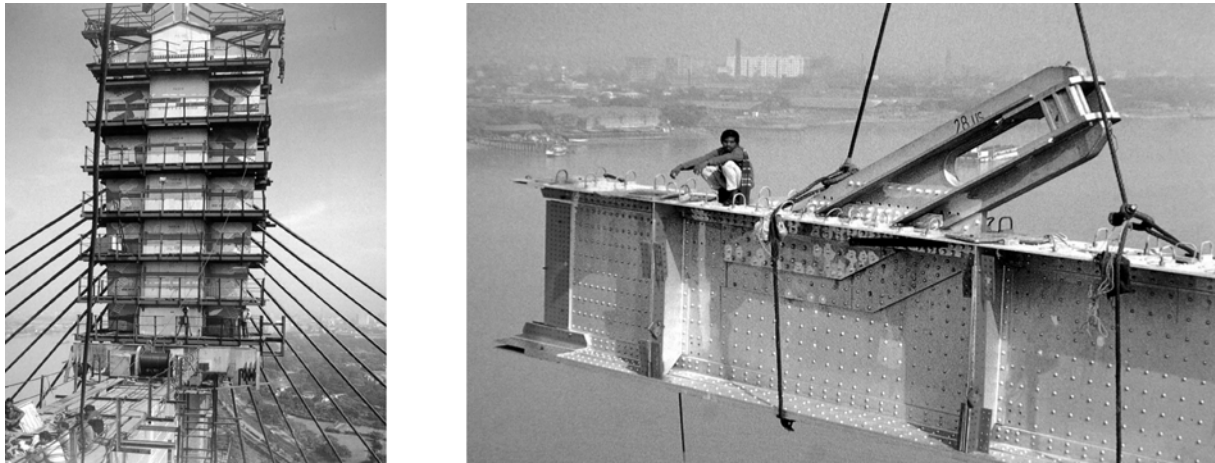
Calcutta bridge, Schlaich. “Flower pot” type pylon anchorage design. Normally tendons are prestressed at deck level. It was decided to prestress the tendons on the pylon to ensure quality control and to facilitate inspection. The steel was riveted together by local labor. (Holgate)
